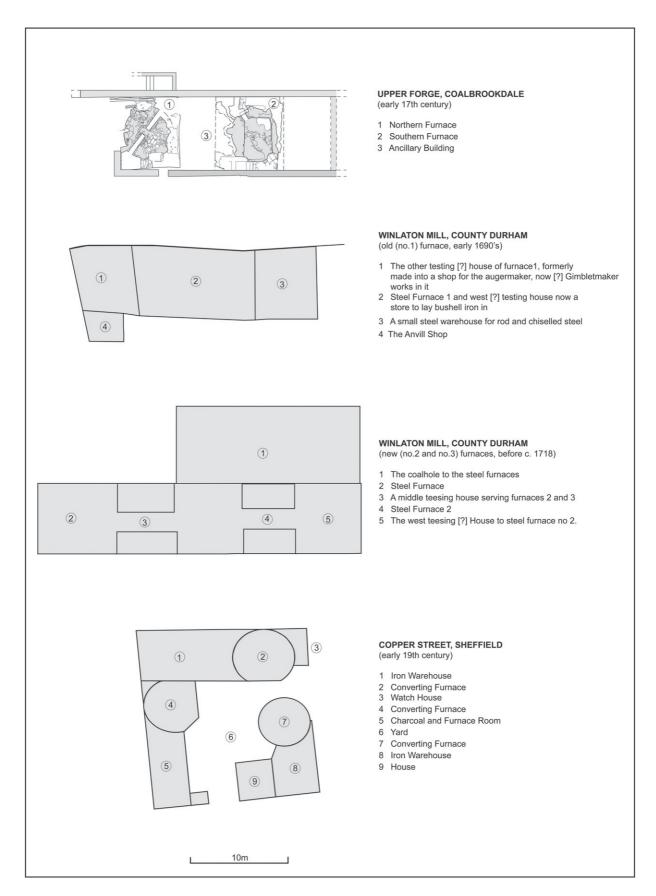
Arrangements of cementation furnaces and ancillary buildings. Top: Upper Forge, Coalbrookdale: shaded walls represent confirmed foundations of steelhouse ancillary buildings (from excavated evidence); Upper Middle: Winlaton Mill, old furnace of c1690 (as shown on a map of c1718); Lower Middle: Winlaton Mill, early-18th-century furnaces, built before c1718 and evidently 'new' on a map of that date; Bottom: Copper Street, Sheffield, early-19th-century cementation site (as shown on a Fairbank plan of 1834).
